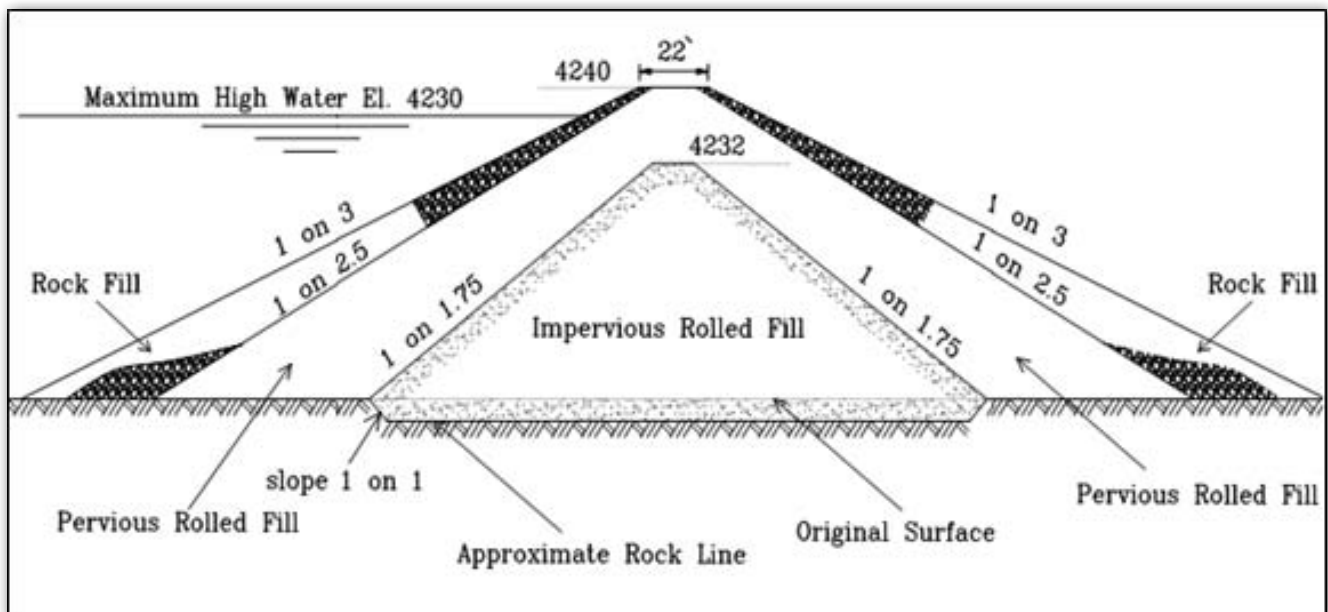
Typical zoned cross section of a zoned earth fill dam
